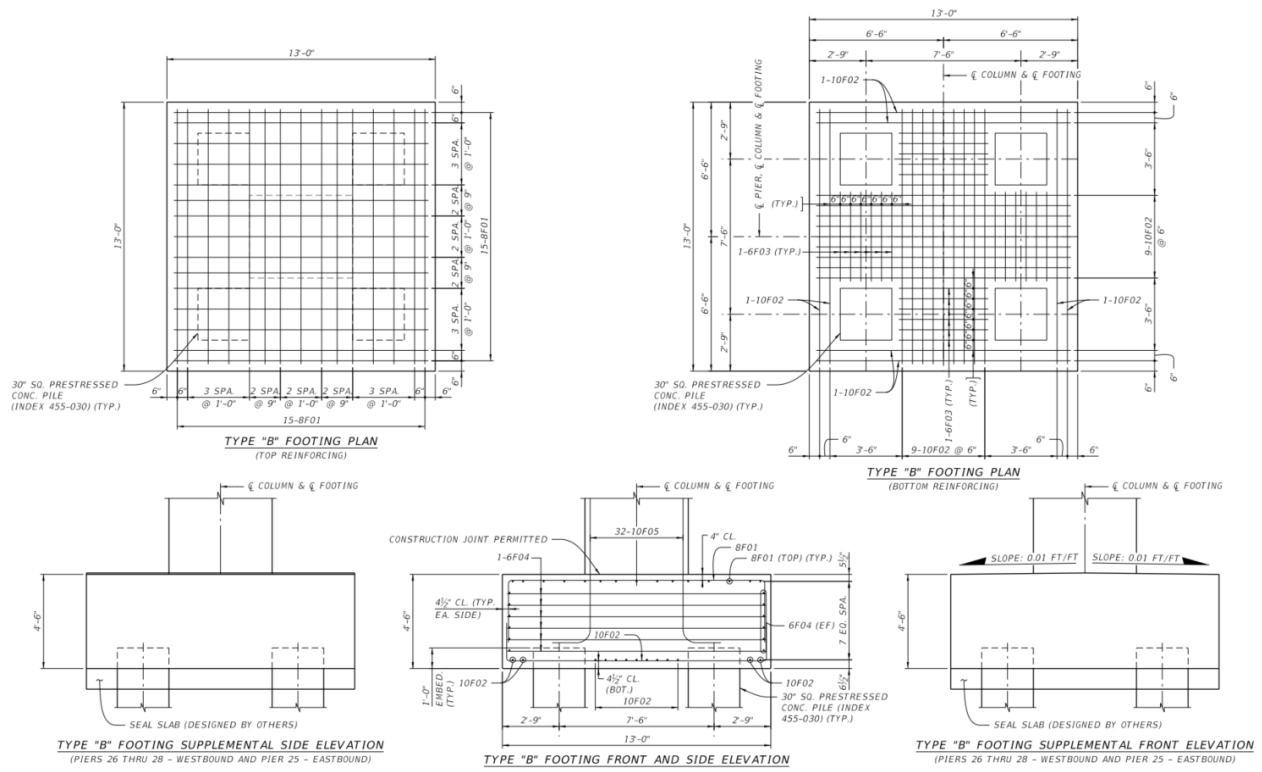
Carbon-steel reinforcement layout – Pile cap 4-pile group “A” of the selected Pier n.25 of the Eastbound Bridge (B1-115)
